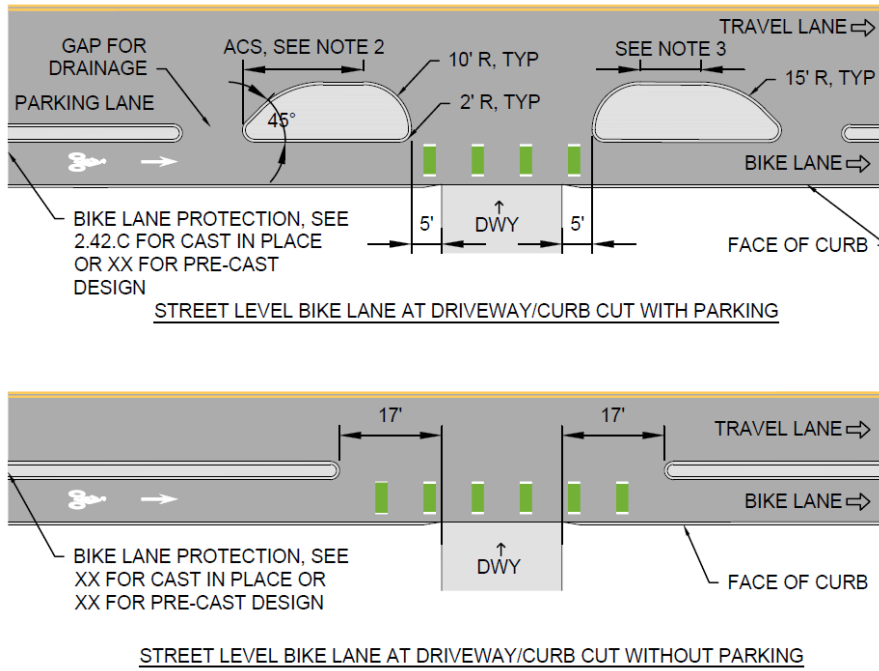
Typical Layout for One-way Street Level Separated Bike Lanes at Driveways
